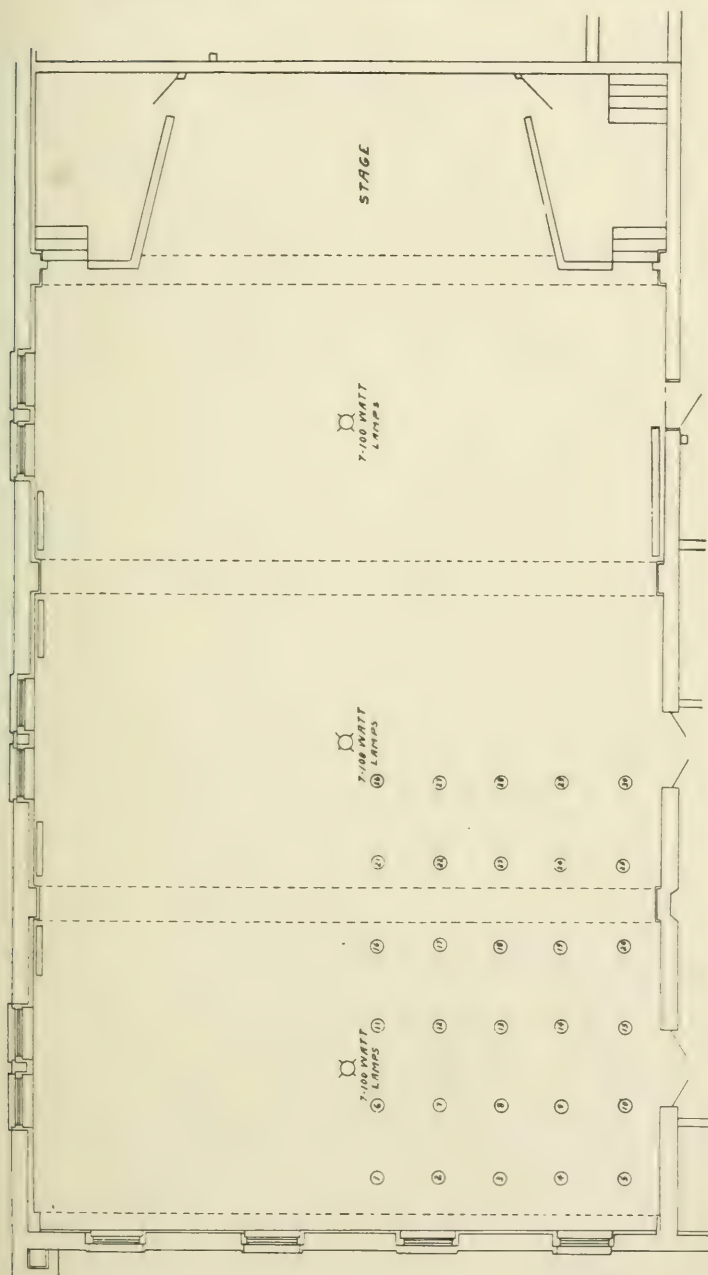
Floor plan of the Village Auditorium showing location of test stations.
